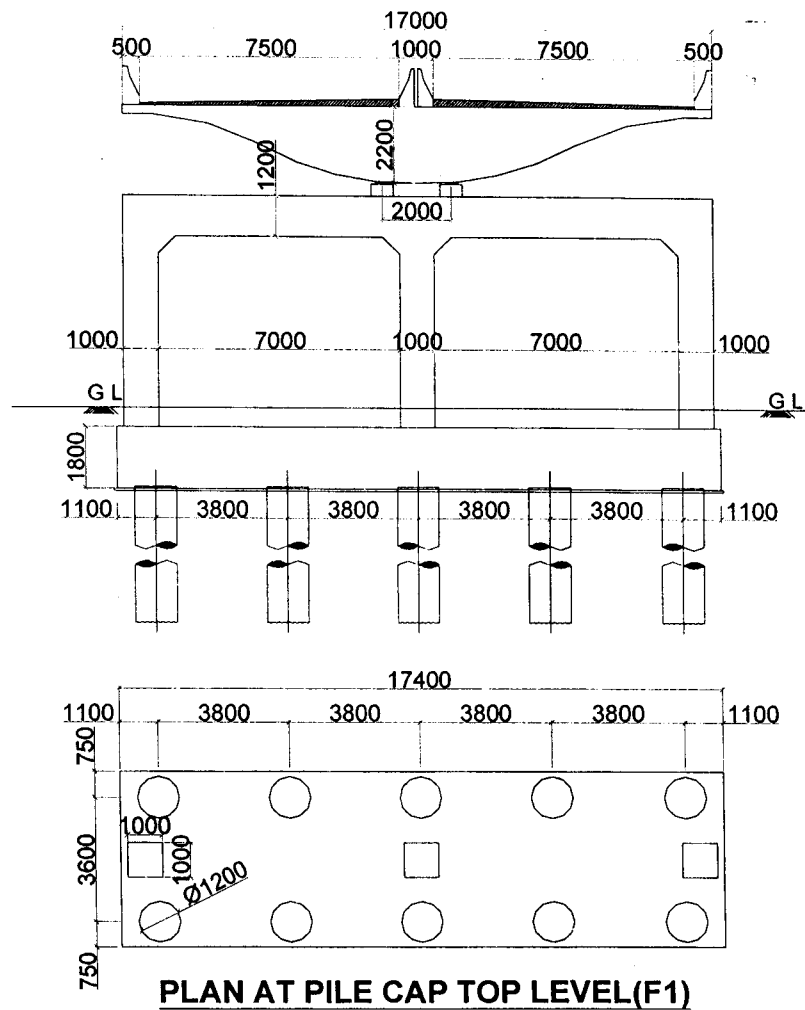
Typical cross section of elliptical pier (double) and pile foundation
